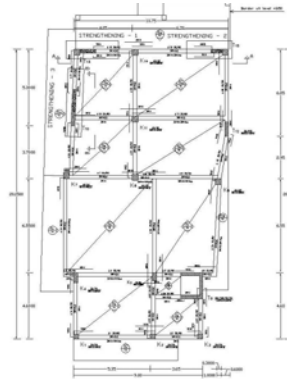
B: Plan View at the Elevation 7.00 m Showing Slabs, Beams, and Vertical Elements of the New (1980) Structure
